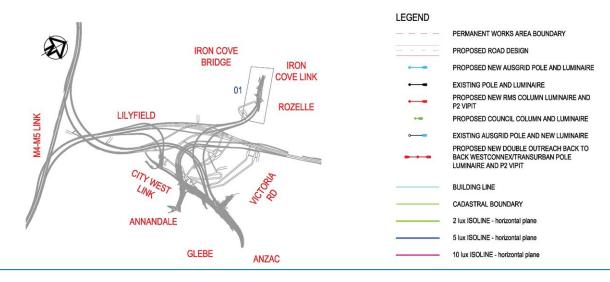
Iron Cove street lighting locations and lighting assessment
